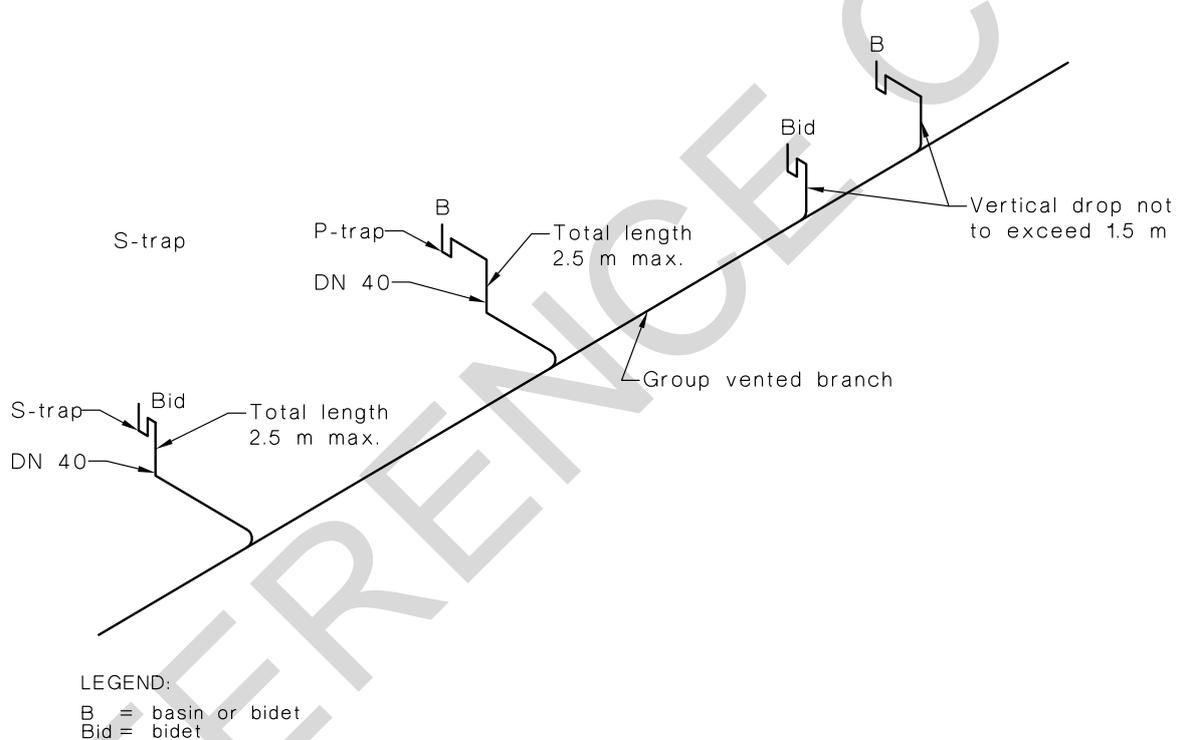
TYPICAL CONNECTION OF BASIN OR BIDET TO A GROUP-VENTED BRANCH
